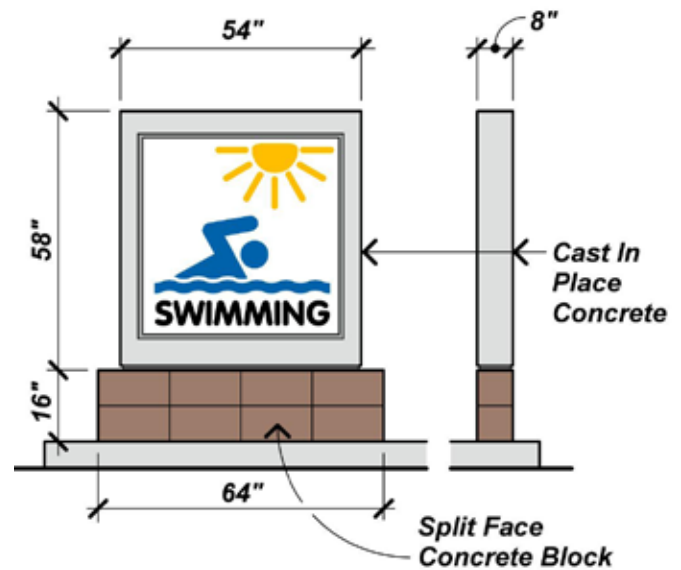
MCCS Facility Sign with concrete block base shown.
